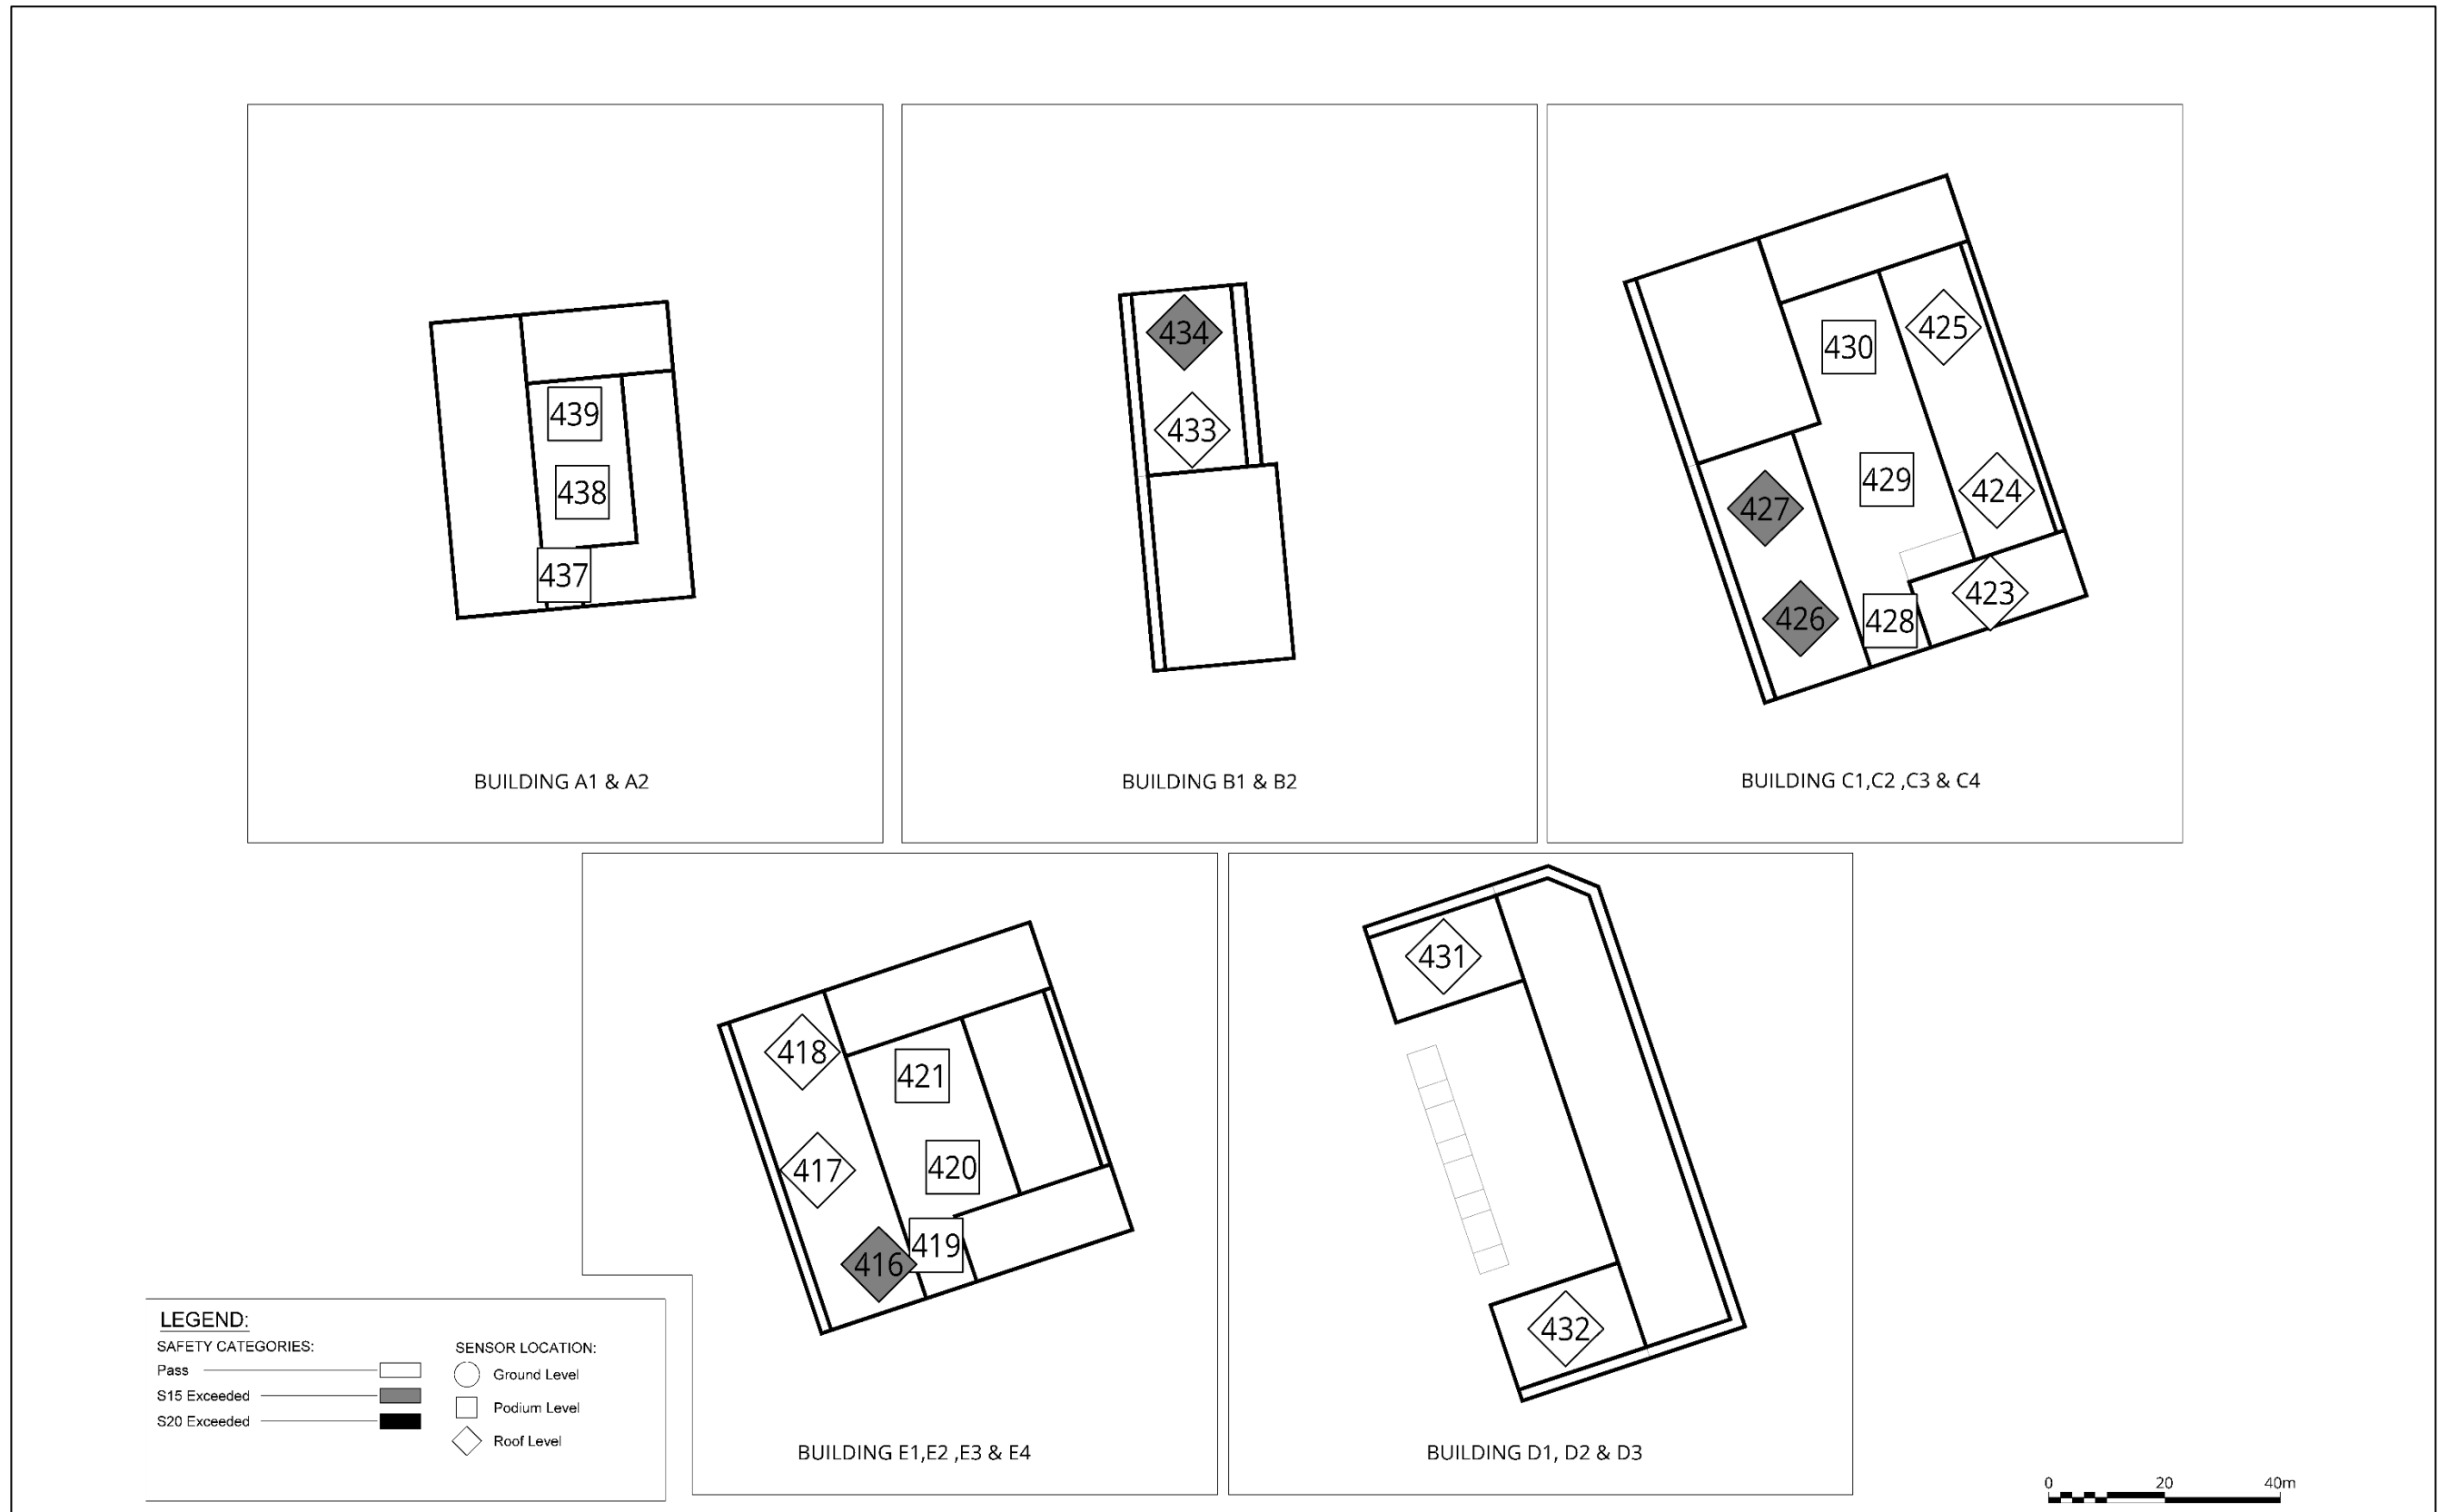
Configuration 3: Proposed Development (Outline Proposals) and Phase A with Existing Surrounding Buildings – Elevated Levels (Strong Winds)
